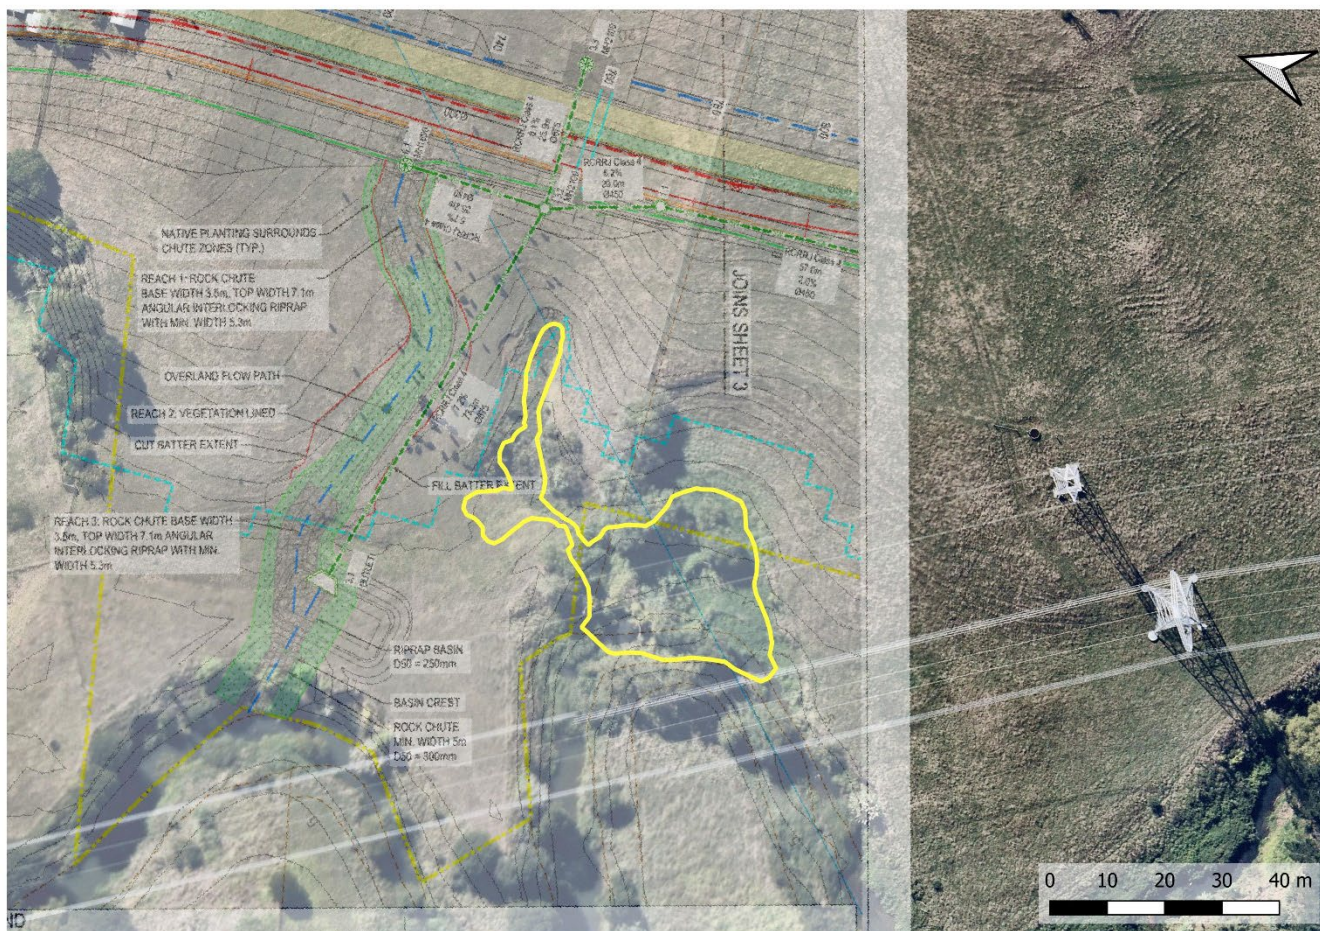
Wetland 2 (yellow) and proposed overland flow path with native plantings and stormwater outlet. (Source: Aurecon, Proposed stormwater layout plan Sheet 2, DRG-WD-0102, overlaid on aerial photography).
